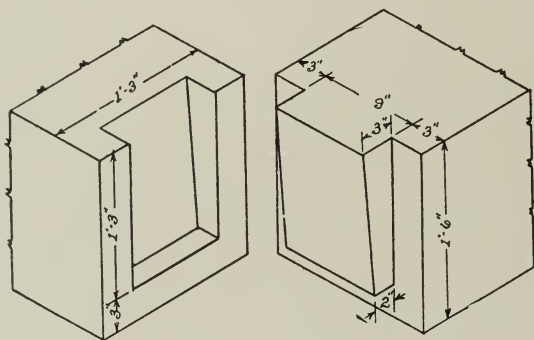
Stone Voussoirs for Flat Arch. Vertical Face Joints. Sloping Interior Joints.
